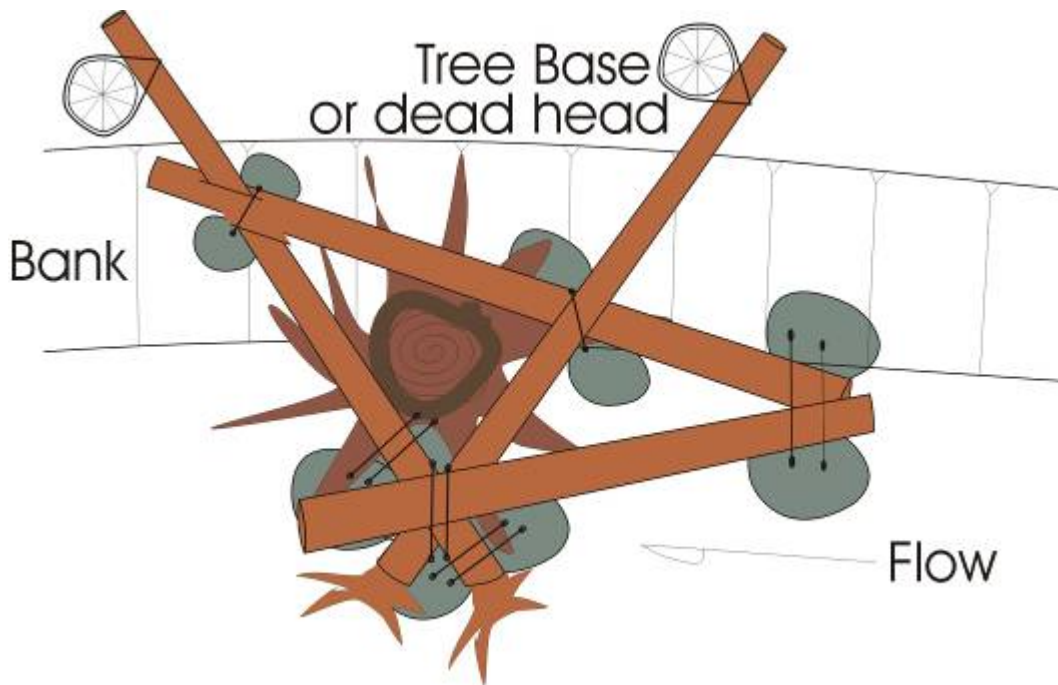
Alternative lateral triangular rootwad-structure design with two ramp logs and attached stump-rootwad to add habitat complexity.
